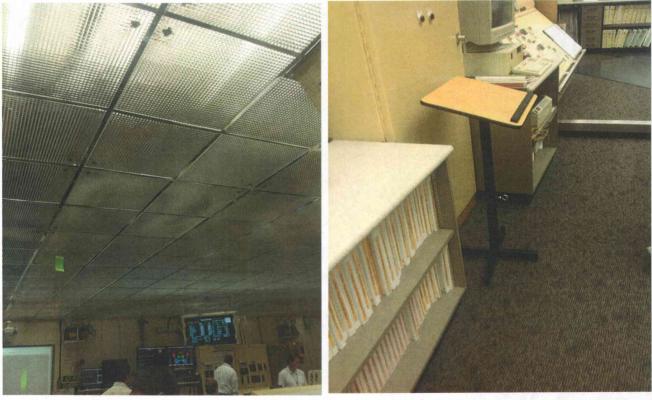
Ceiling Tiles and Lighting Fixtures Anchored Photo 2 Small Podium Not Anchored
